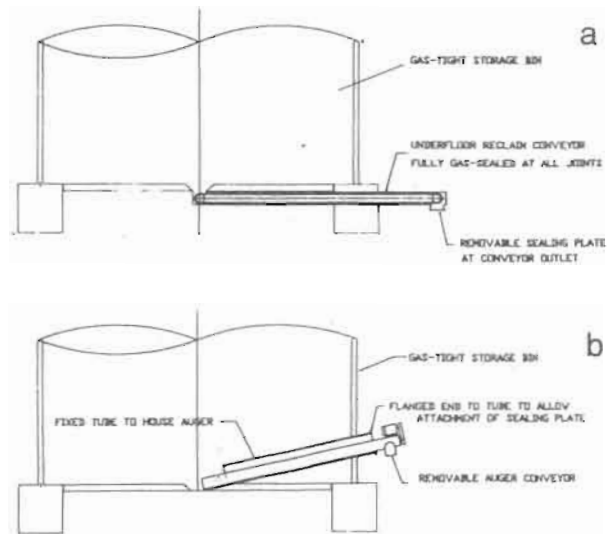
Gas sealing of discharge conveyors: (a) sealing of the conveyor; (b) removable conveyor with sealable access tube.
